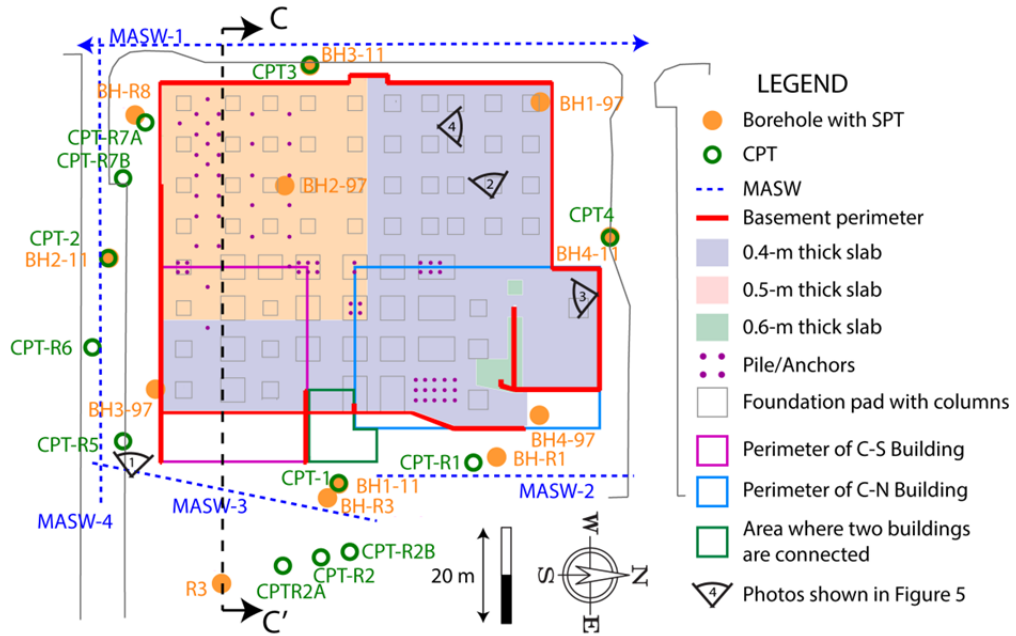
Building C basement and structure plan areas with geotechnical data.
